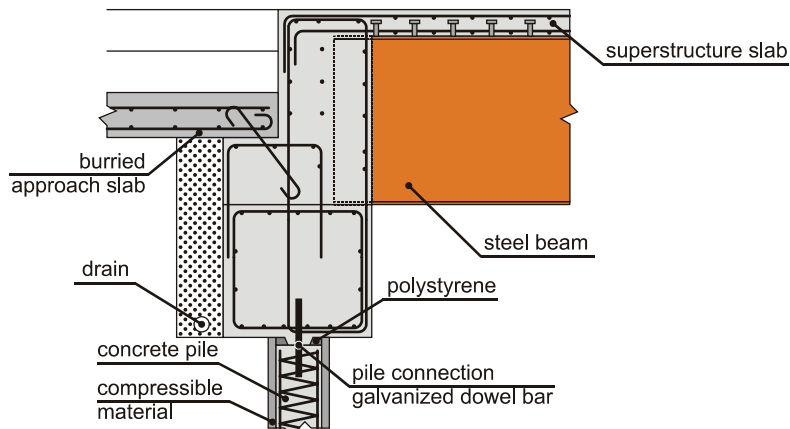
Abutment with hinged-piles (acc. to Connal, 2004))
